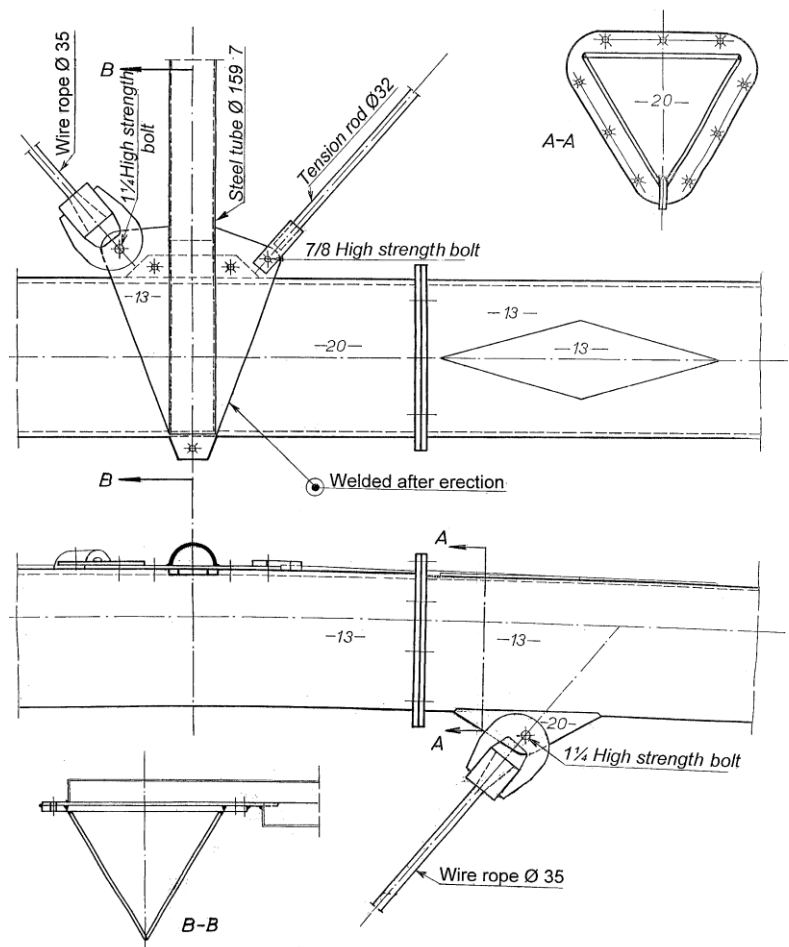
shows details of the second tube in the wind bracing at Steinkjer
